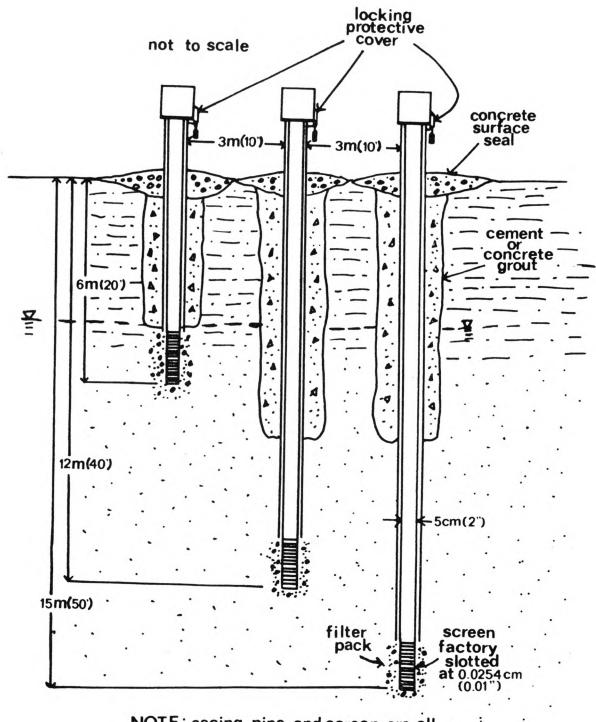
Proposed (1987) Groundwater Monitoring Well Construction Design
